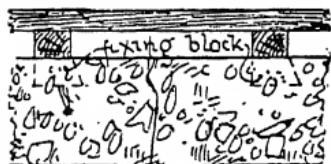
Boarded Concrete Floor with Wood Fillets secured to Fixing-Blocks.
